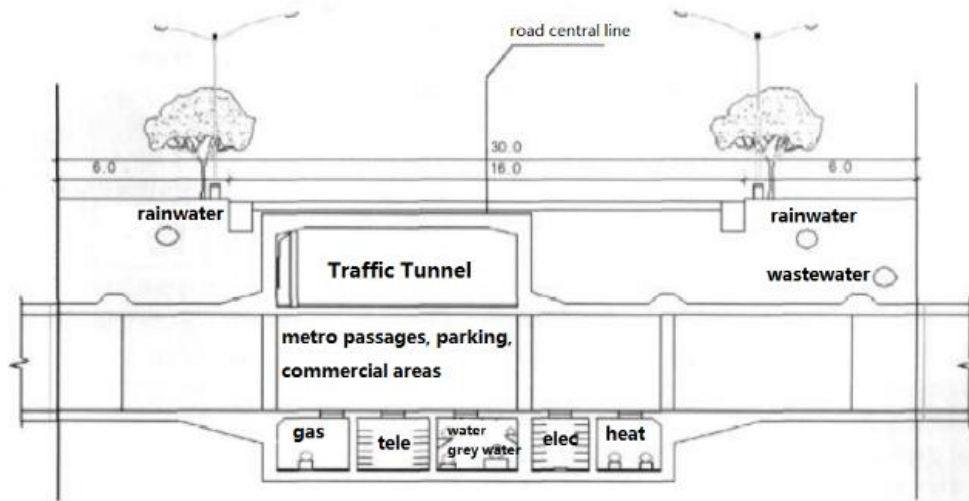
Cross-section of underground layout including Zhongguancun MUT (Su 2007)
